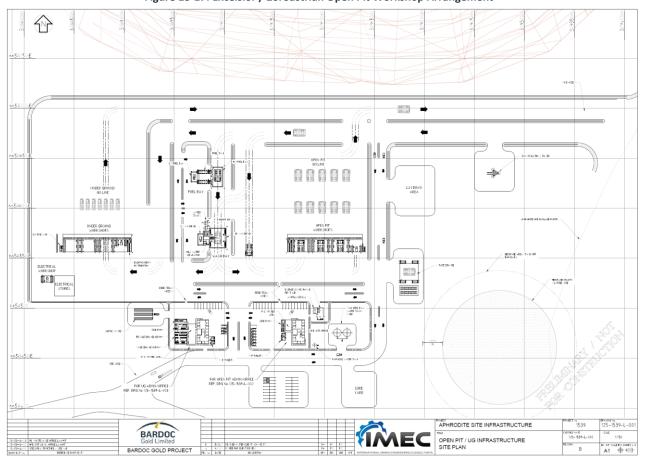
Aphrodite Open Pit and Underground Workshop Arrangement
